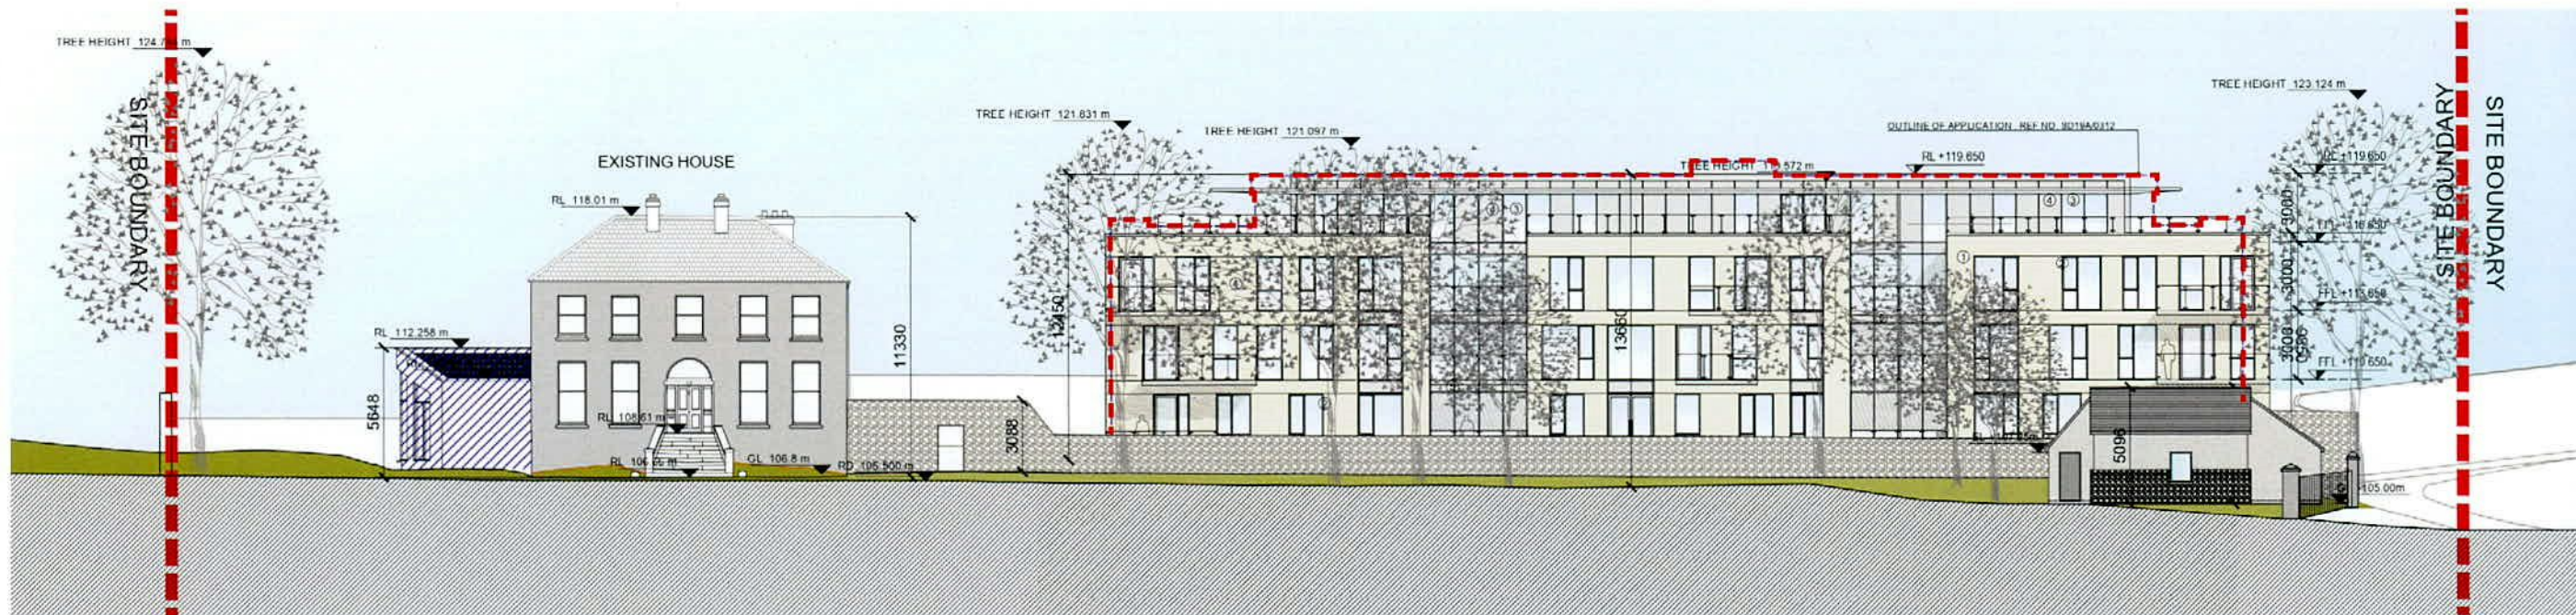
IMAGE : Proposed Site Section of Current Application - Prospect House + Block of Apartments
